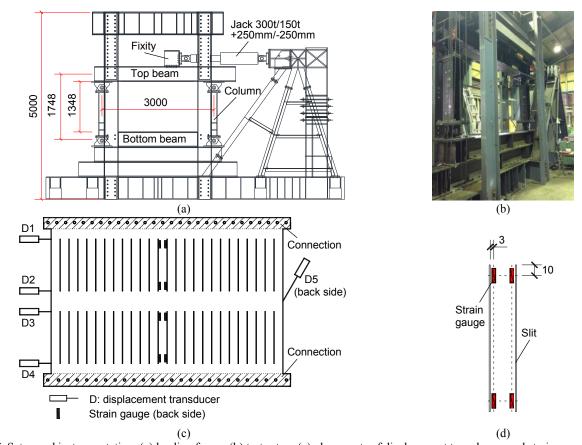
Setup and instrumentation: (a) loading frame; (b) test setup; (c) placements of displacement transducers and strain gauges
